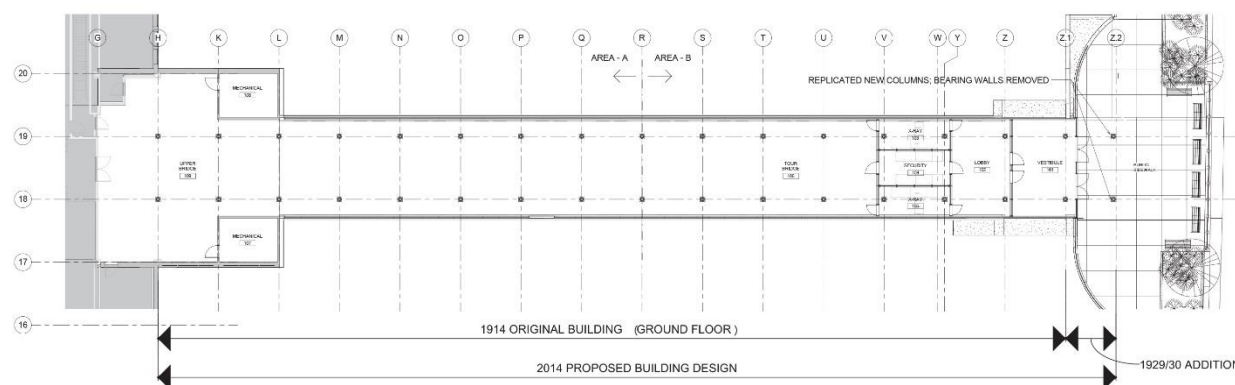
View of the 1914 original building, the 1929 addition and the scope of the proposed building design
